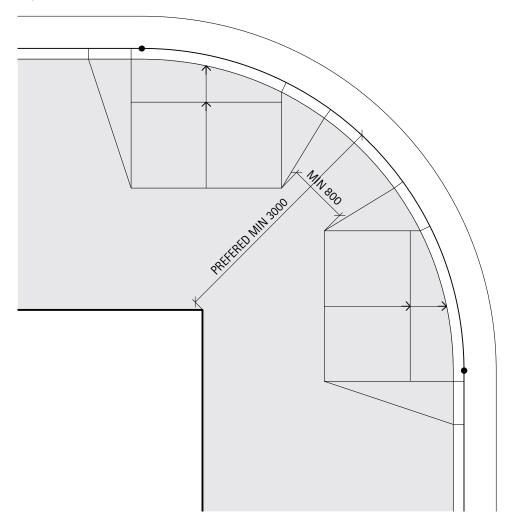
Kerb Ramp Arrangement Showing Minimum Distances
